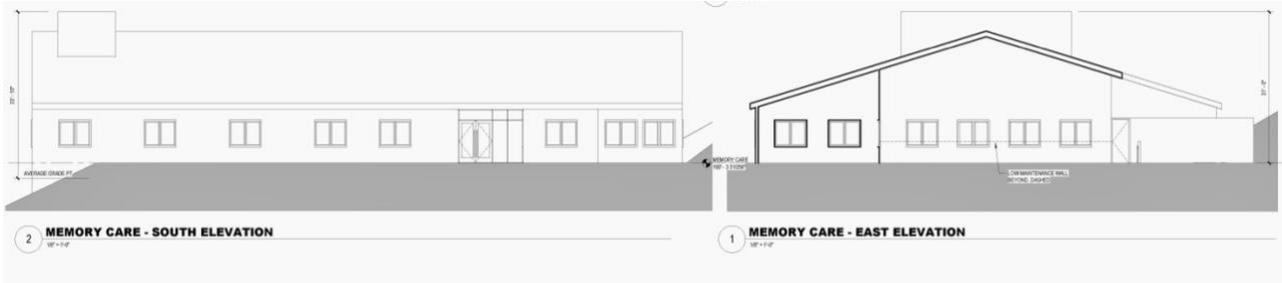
Elevations of proposed Memory Care Facility, taken from Sheet A-11C of the Carmel Valley Master Plan design submittal.
